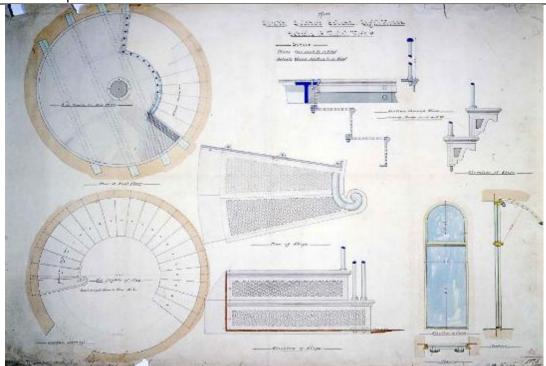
Architectural plans, 1879: Scale drawing of South Solitary Island Lighthouse, including cross sections and floor plans.
